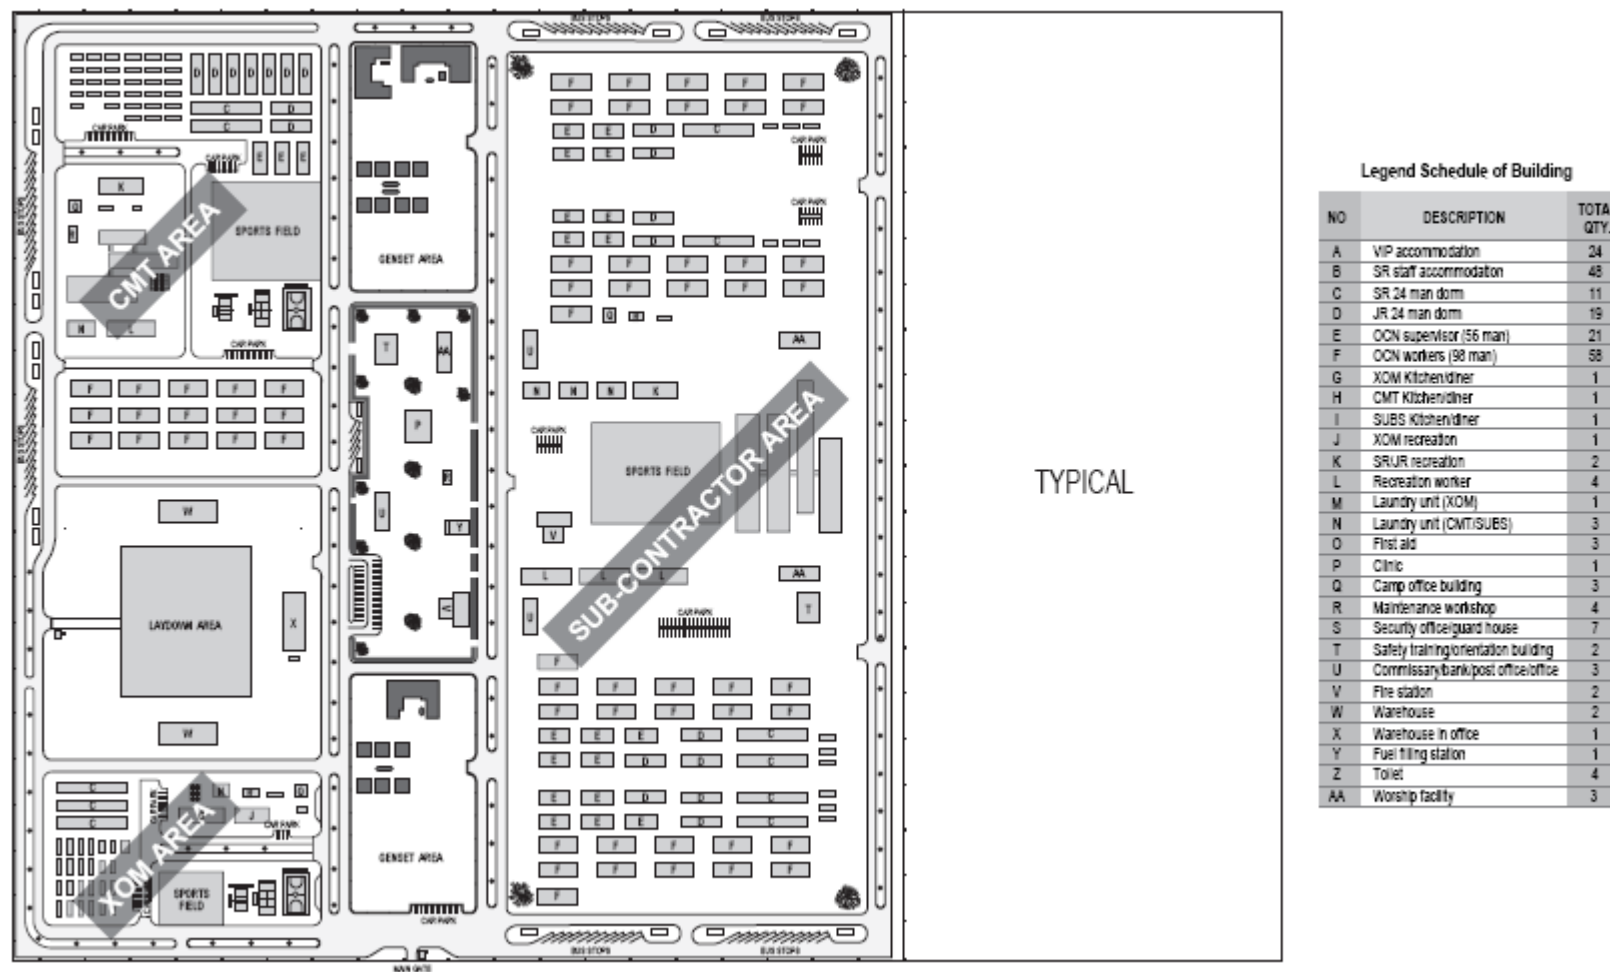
Typical 7,500 man camp set-out plan (Source: Coffey Natural Systems).
